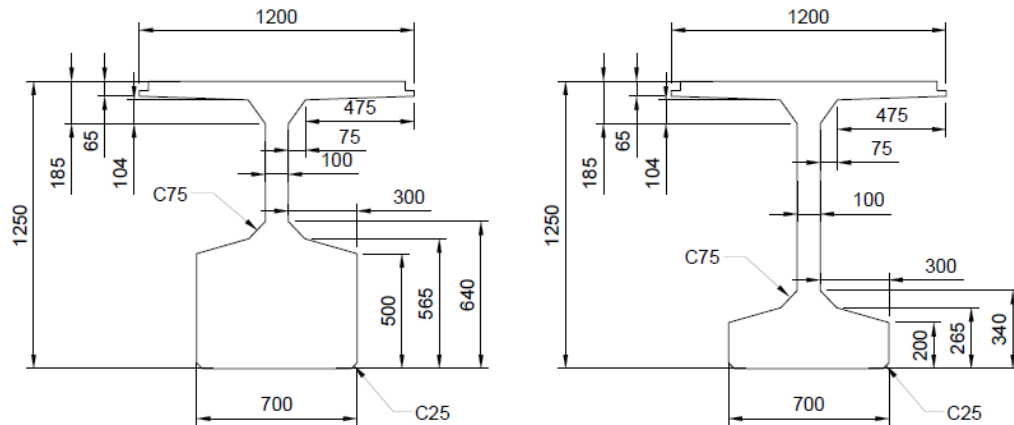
28 Girder section of 30m span UHPFRC post tensioned I girder at support and mid span
